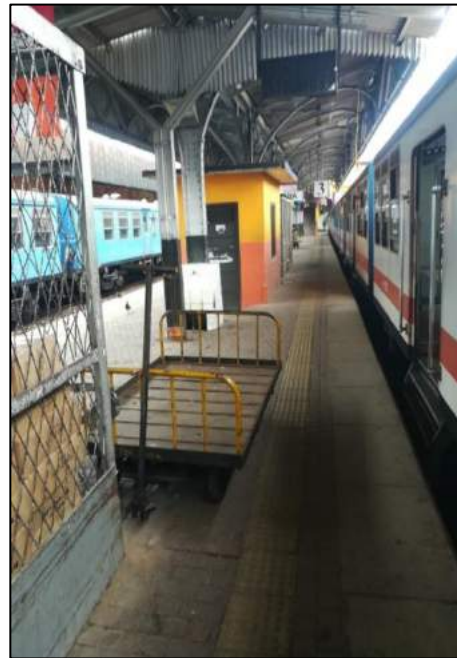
Improperly Built Drinking Water Fountain and Platform Deck (Colombo Fort and Maradana Stations)
